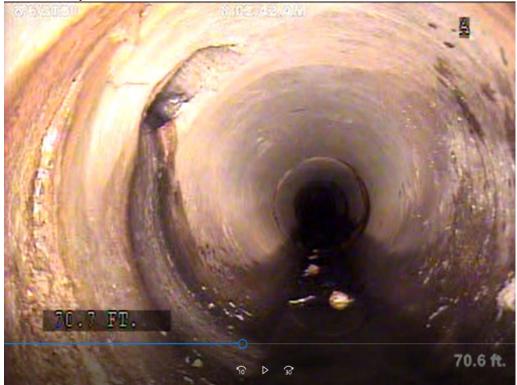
B. Close up of illicit connection – note gray staining at the outlet
